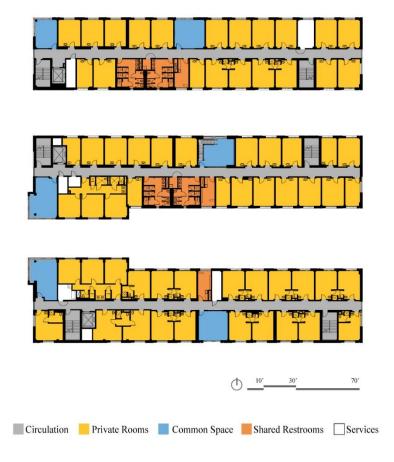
Global Scholars Hall Typical Floor Plans: North Tower (top), Center Tower (middle), South Tower (bottom)
